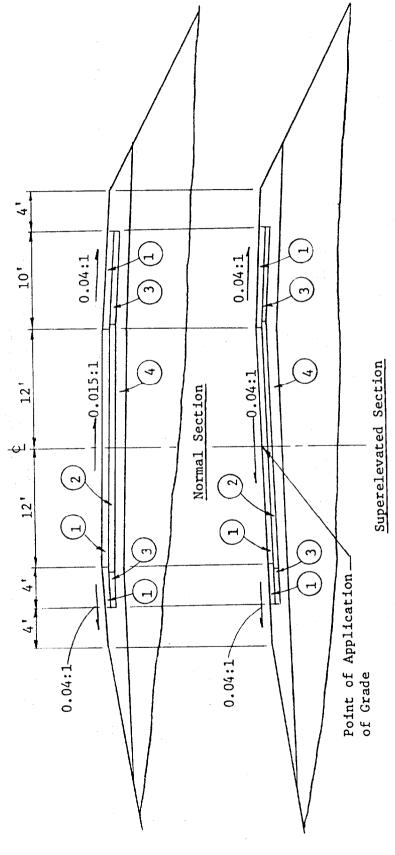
Rigid Pavement Section In Cut-Dimensions And Details For Examples 1, 3, 11, 13, 14 and 17.
